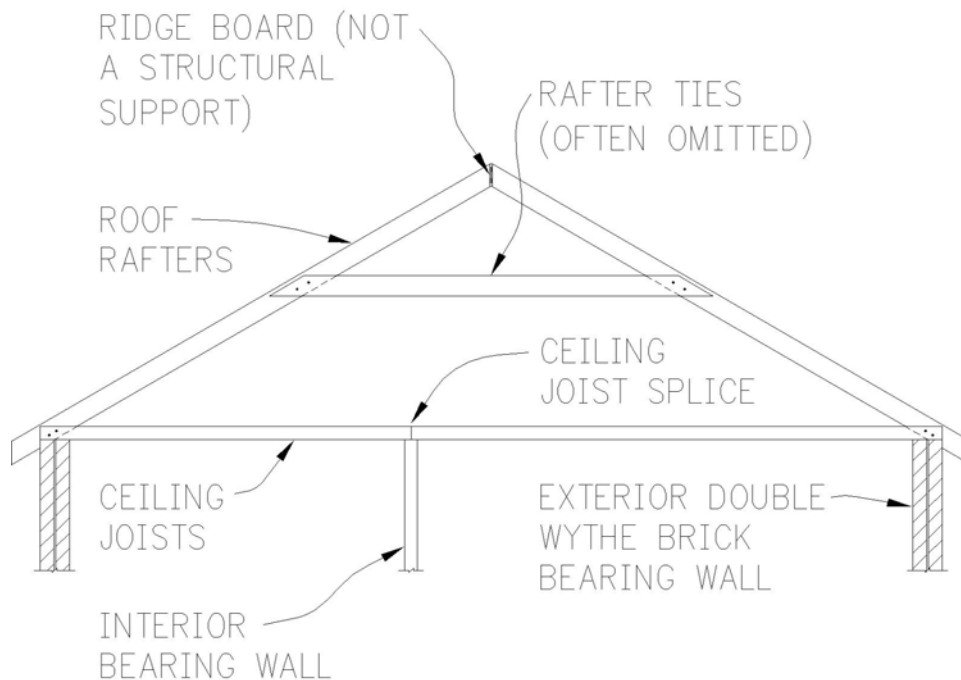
Typical “Denver Bungalow” stick-framed construction.
